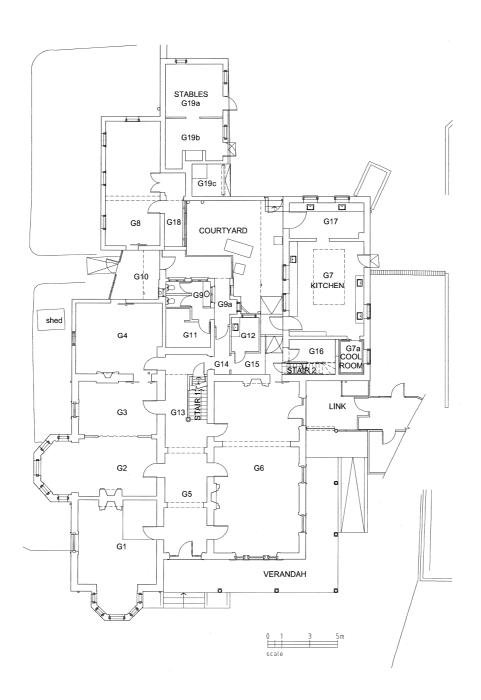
Ground floor plan of the House, existing conditions, not to scale. Source: Tanner Architects 2010.
